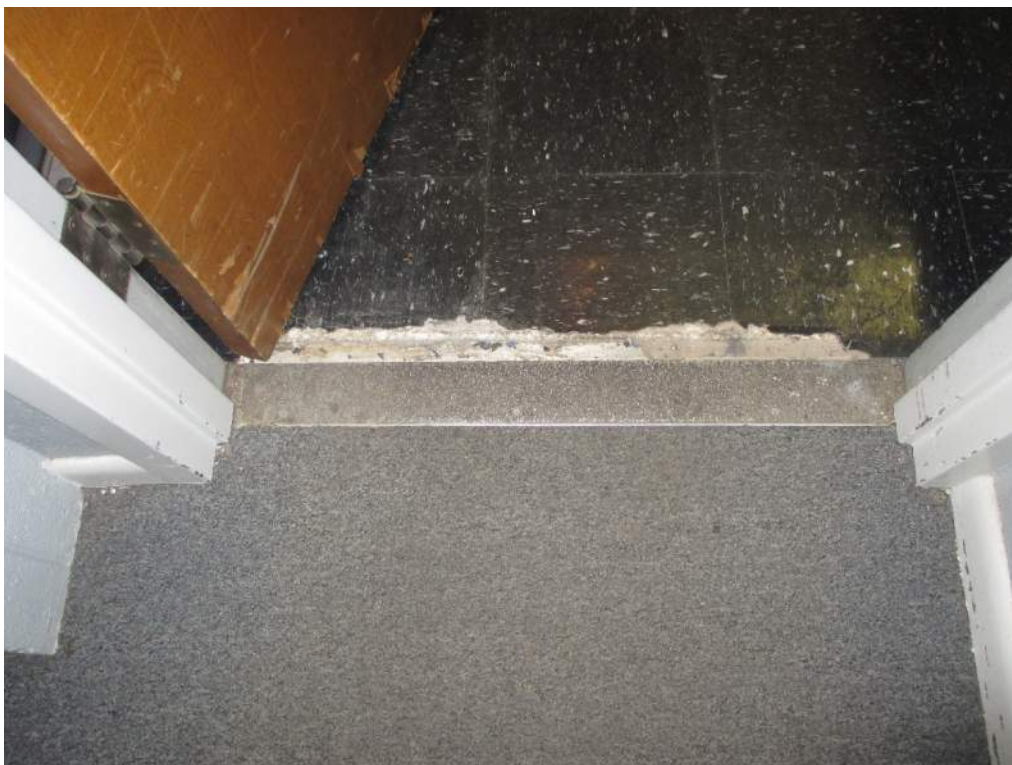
Condition of a floor joint at door into north meeting room of the original building.
